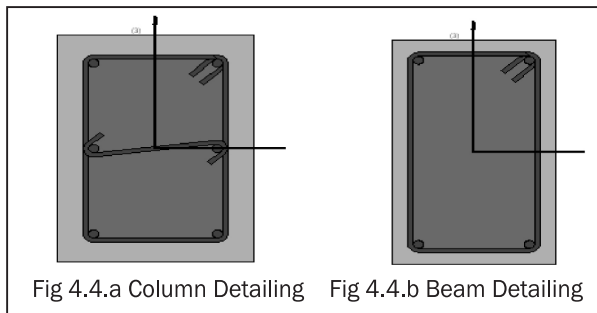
a Column Detailing Fig 4.4.b Beam Detailing
